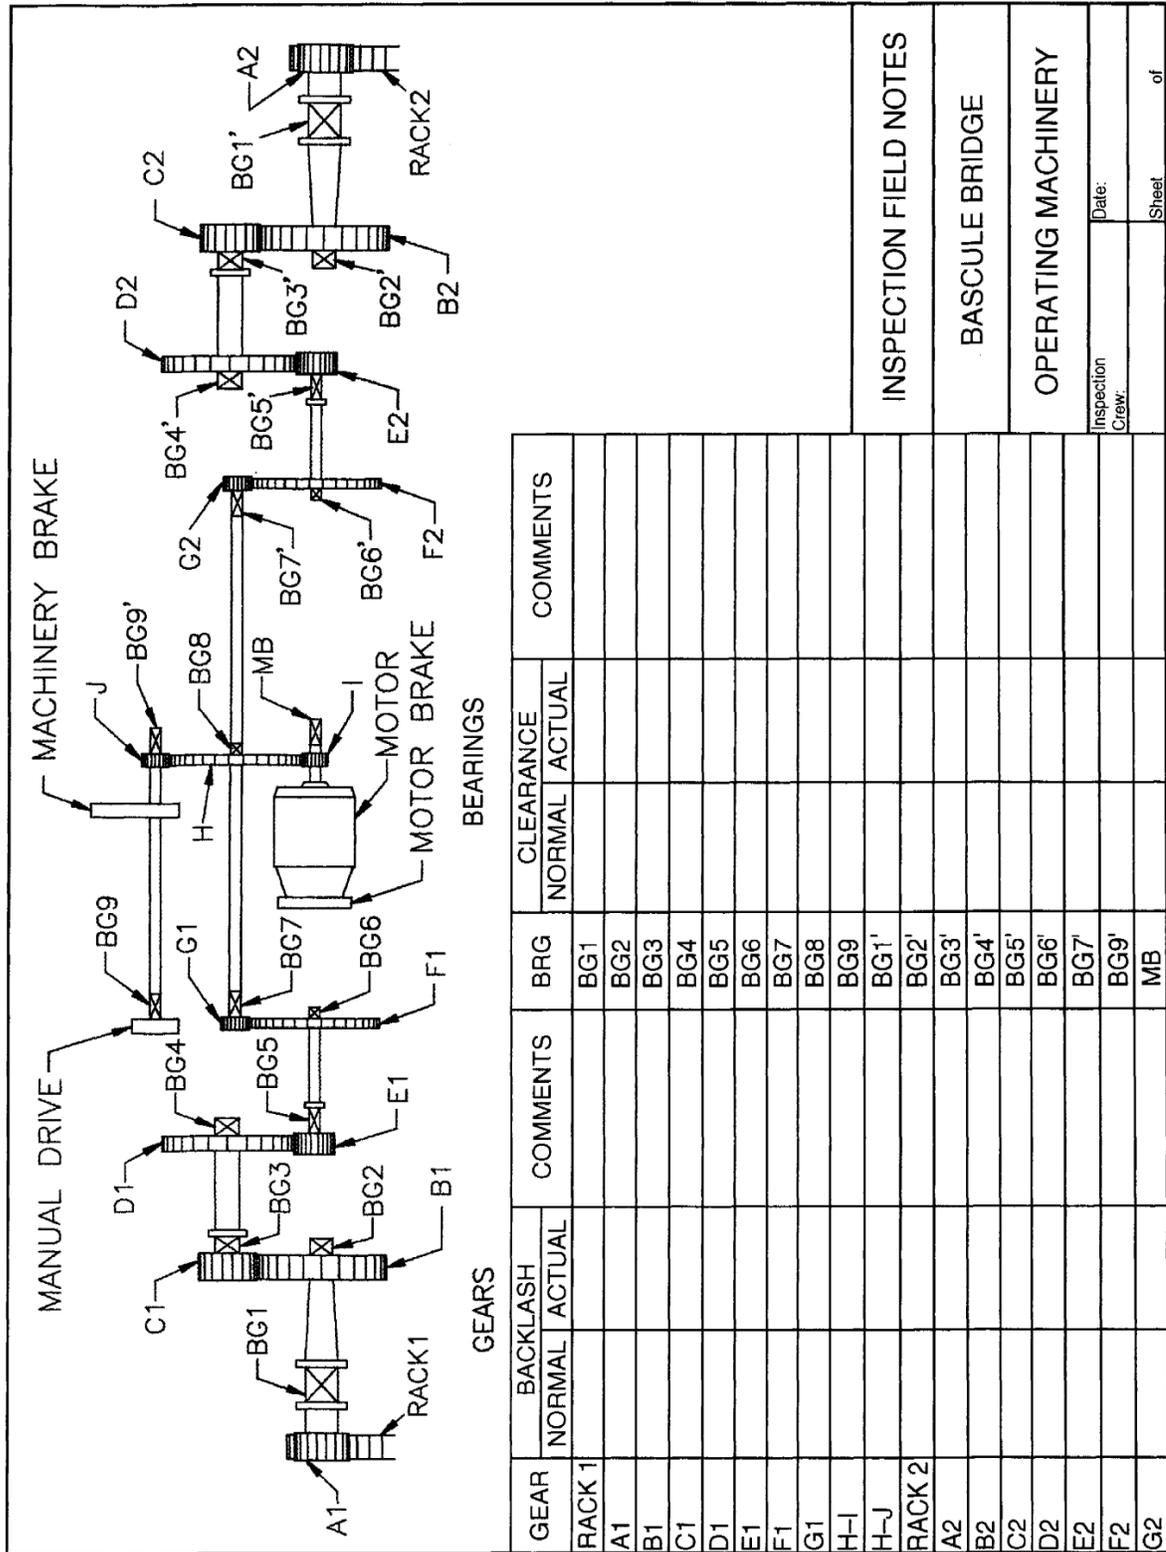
Typical drive machinery layout sketch of a bascule bridge
